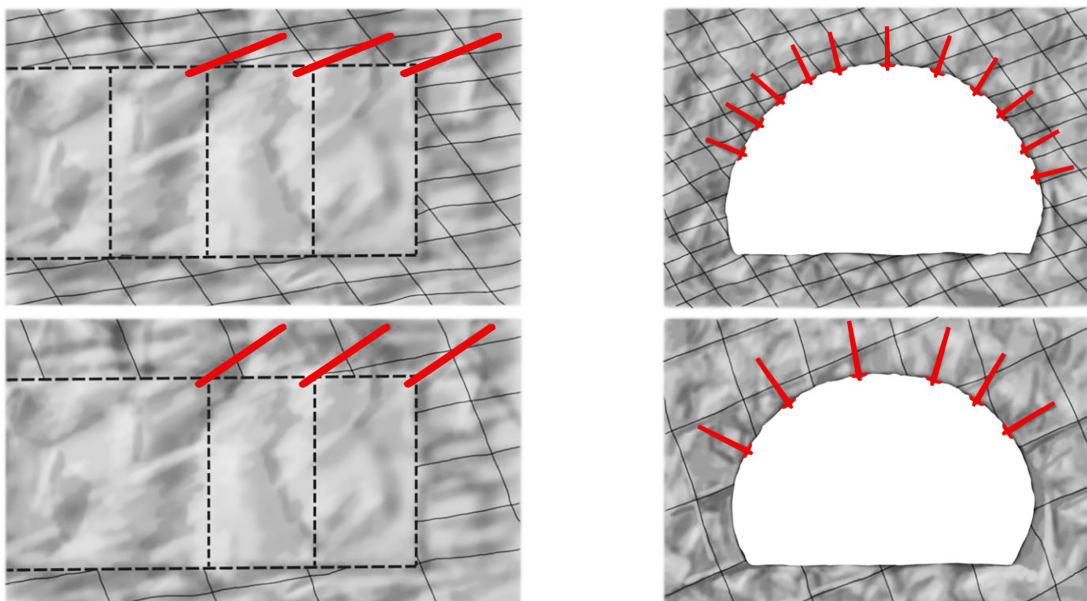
Example of spiling in a cutting or tunnel entrance/exit face prior to blasting (left) and after blasting (right)
